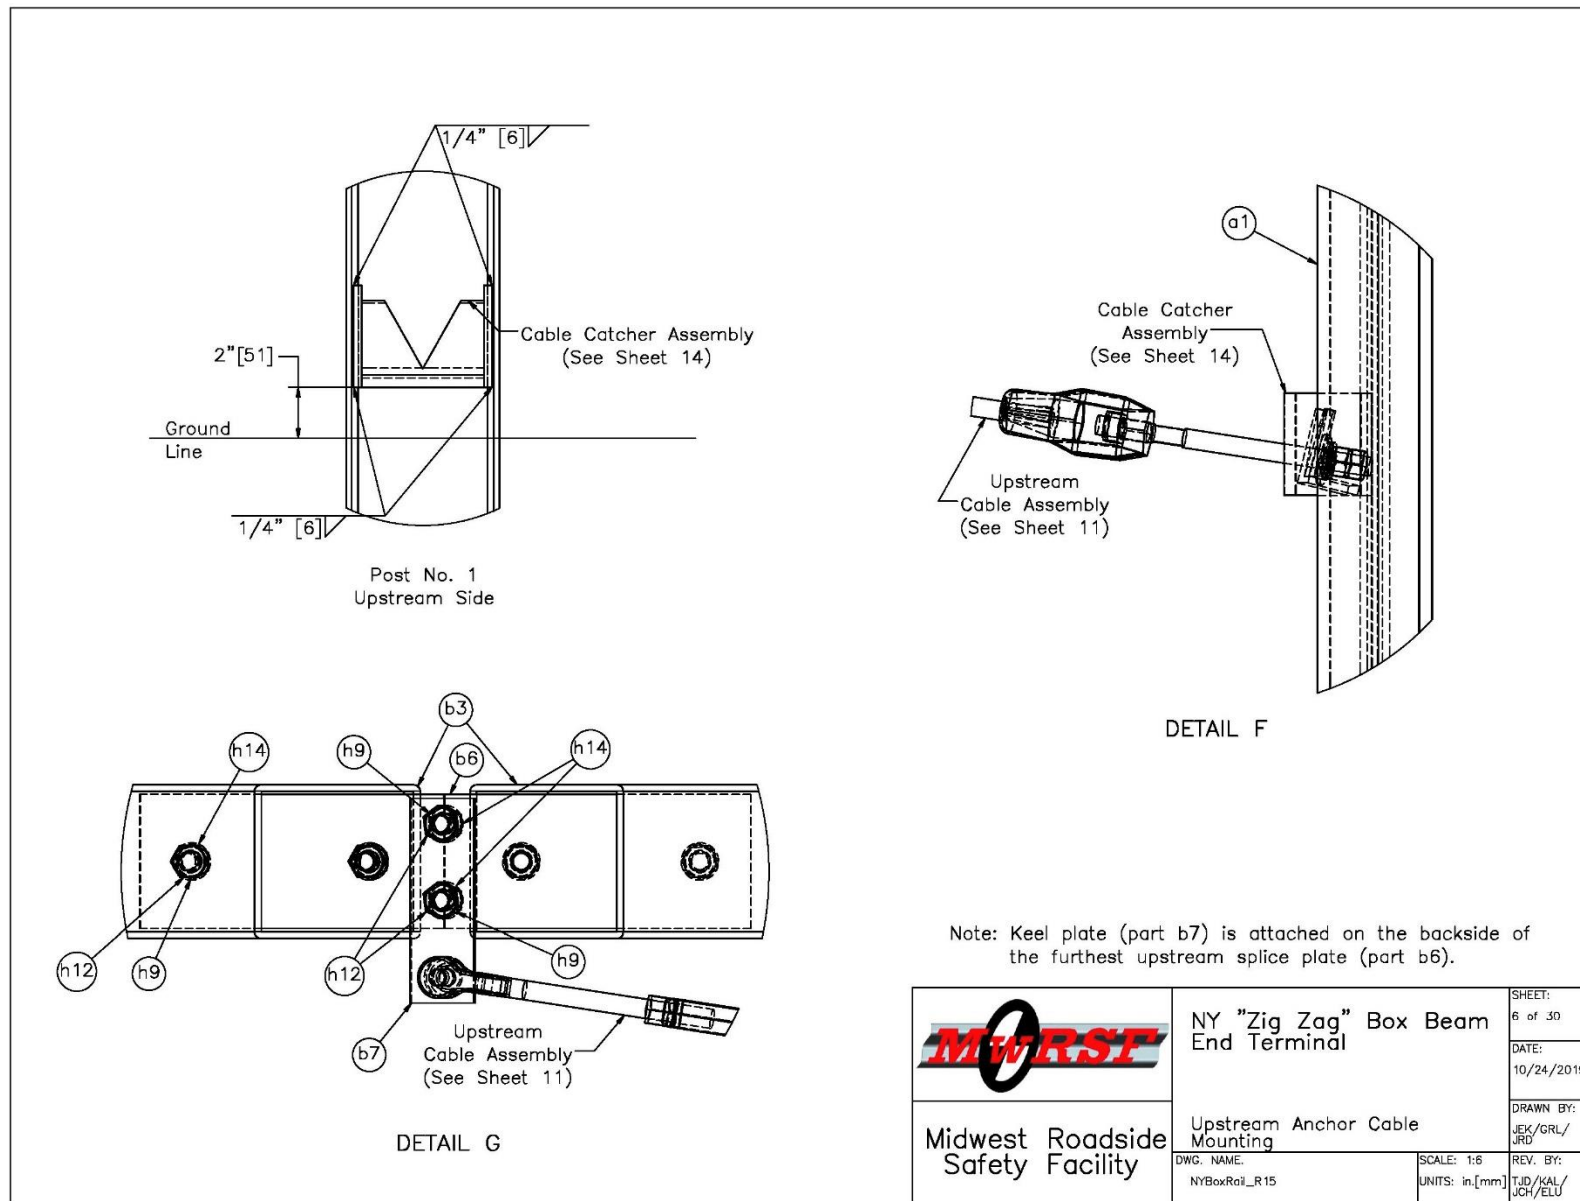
Upstream Anchor Cable Mounting, Test No. NYT-1
